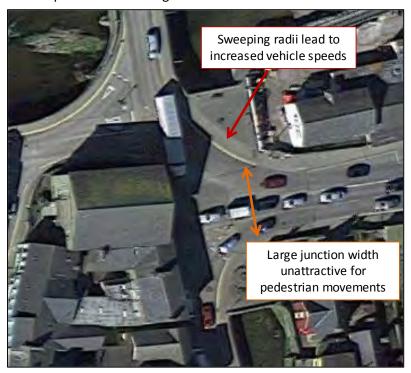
Glasslynn Road/St. Finbarr's Place Junction Issues
